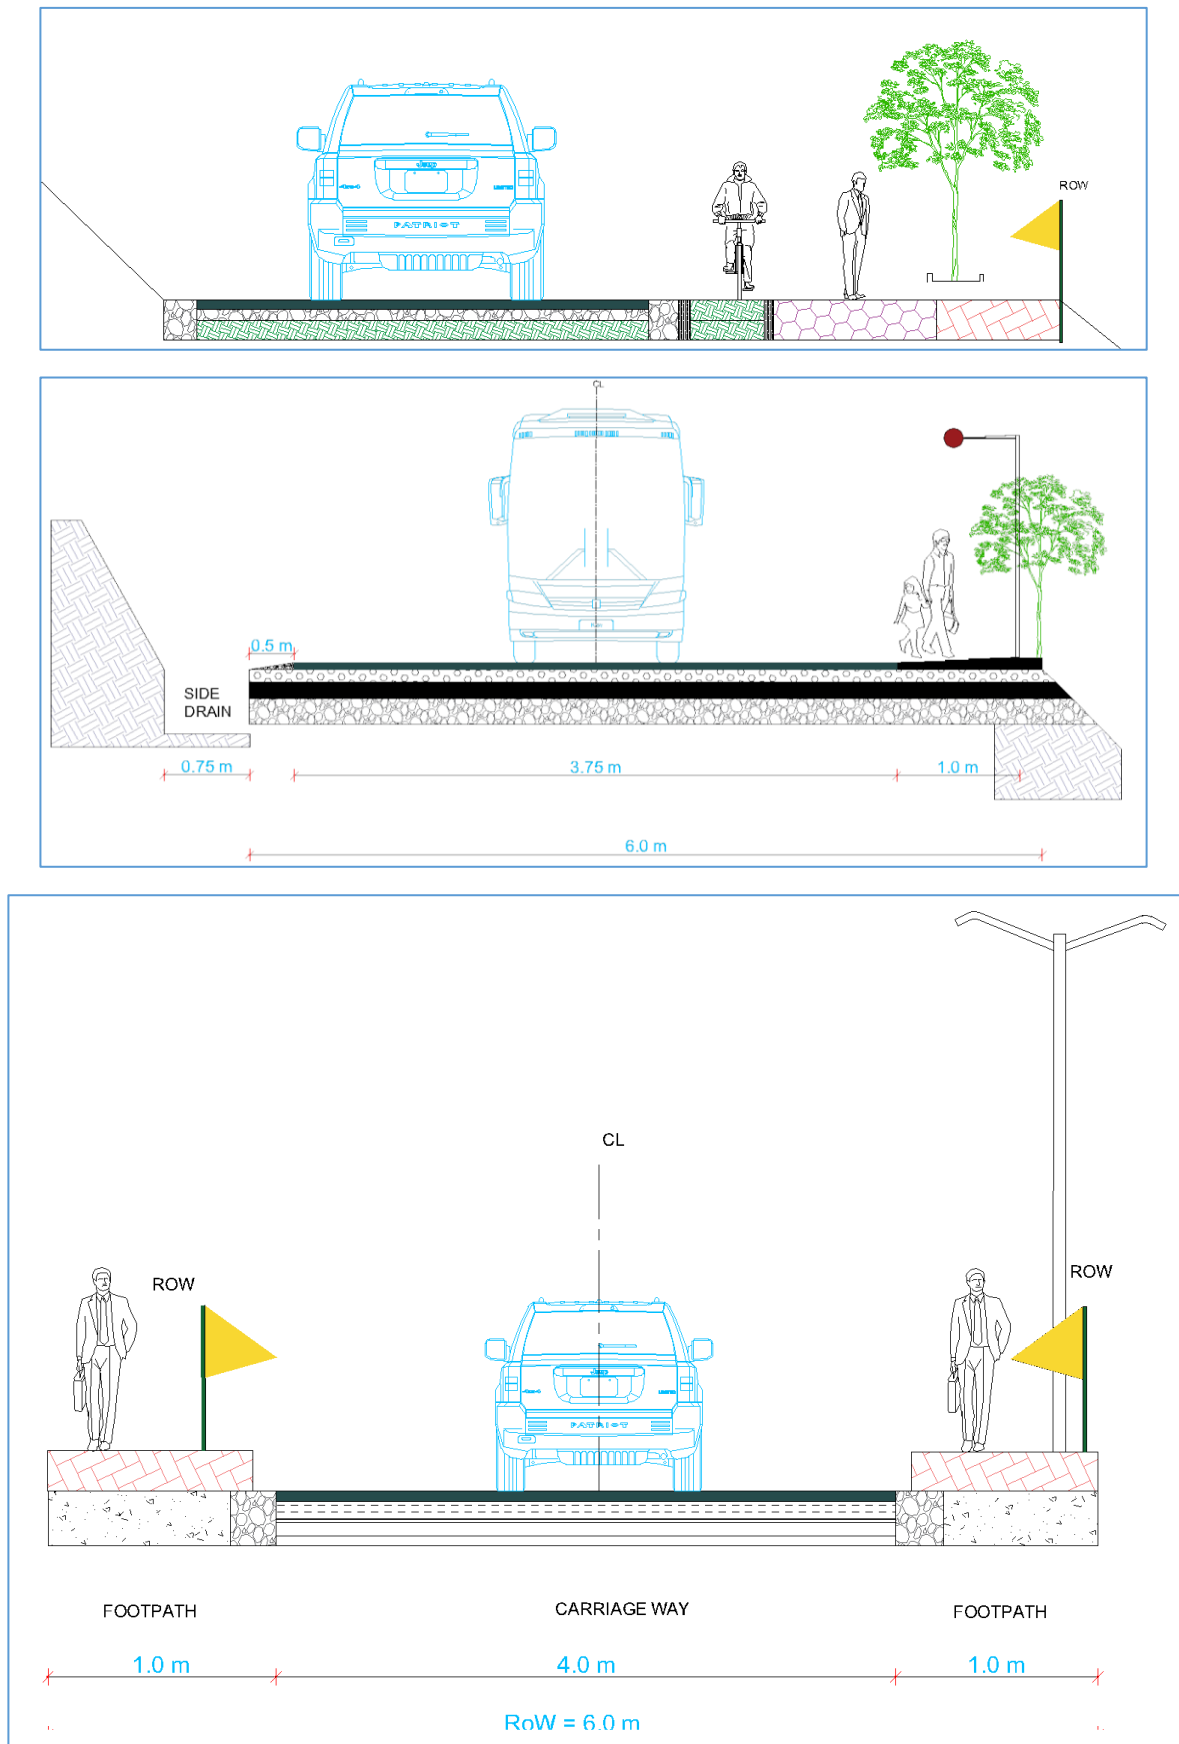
Typical Cross Section of Local Road (Class D)
